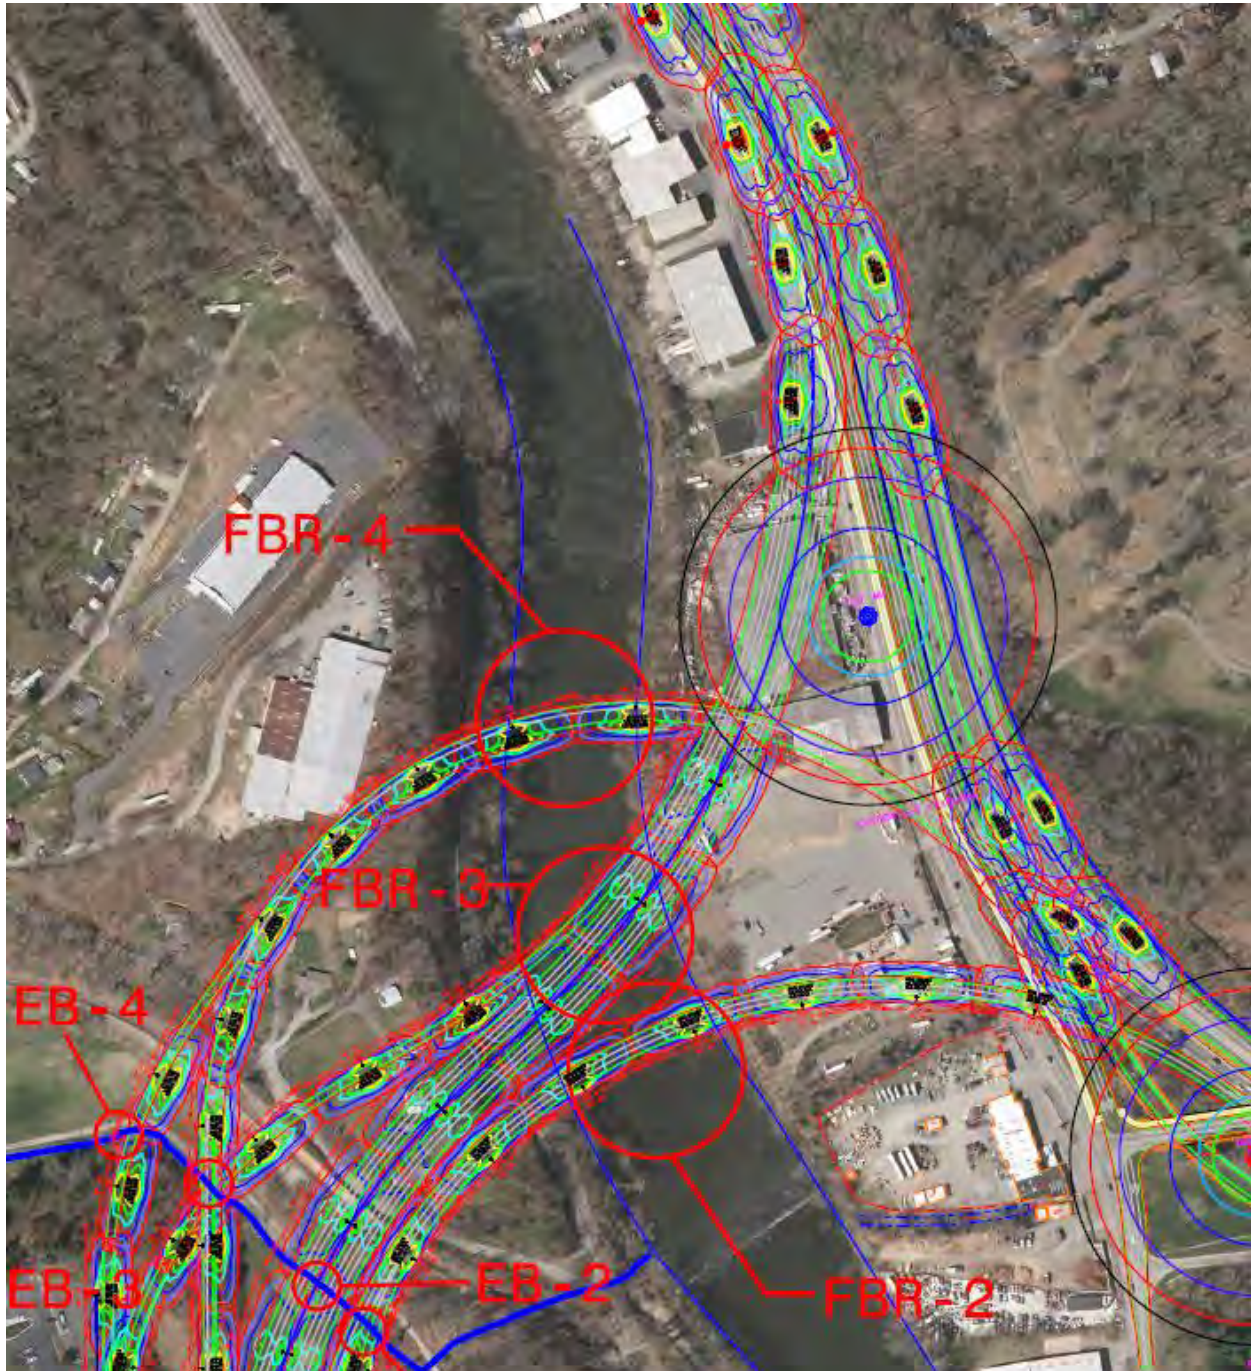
Mitigation lighting layout showing removed high mast poles at FBR-2, FBR-3 & FBR-4 crossings.
